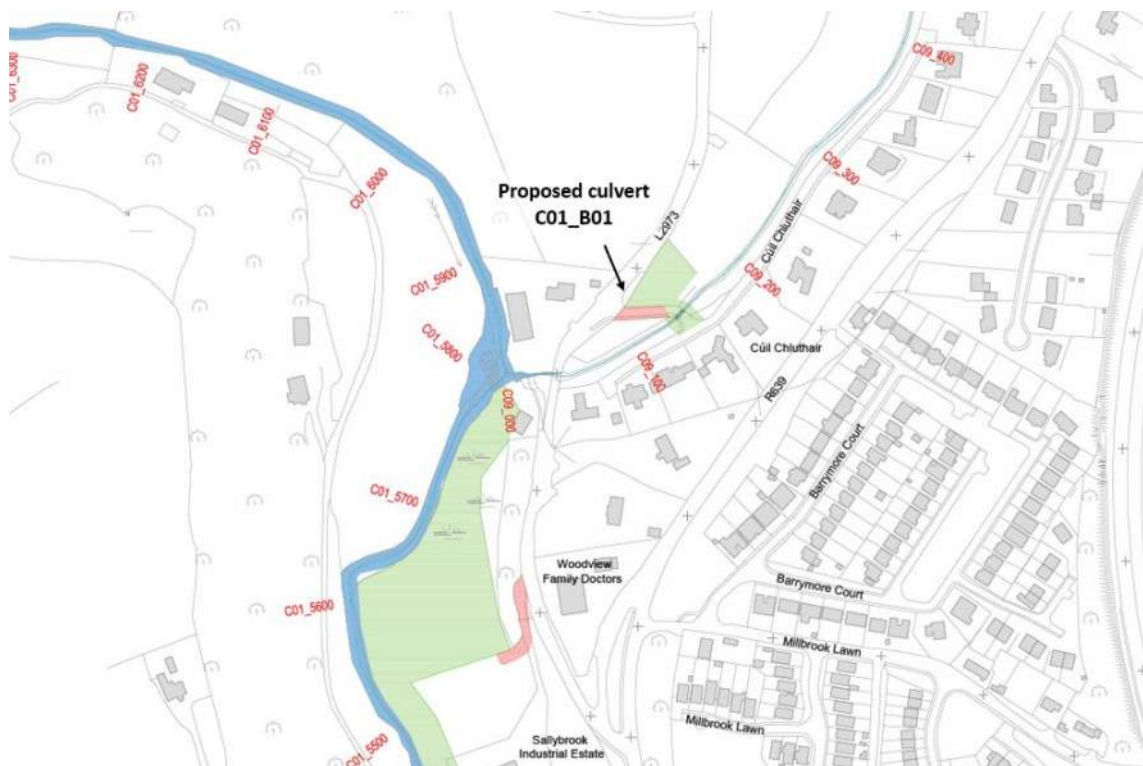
Location of proposed culvert upgrade in Cúil Chluthair housing estate (from drawing ref. GR\_501)
